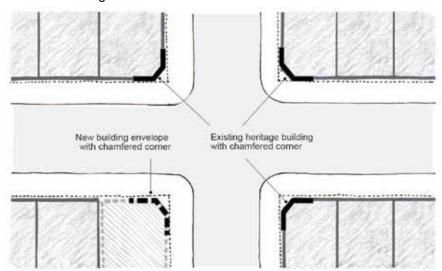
Incorporation of corner splay to a commercial building where this is typical of the area.
